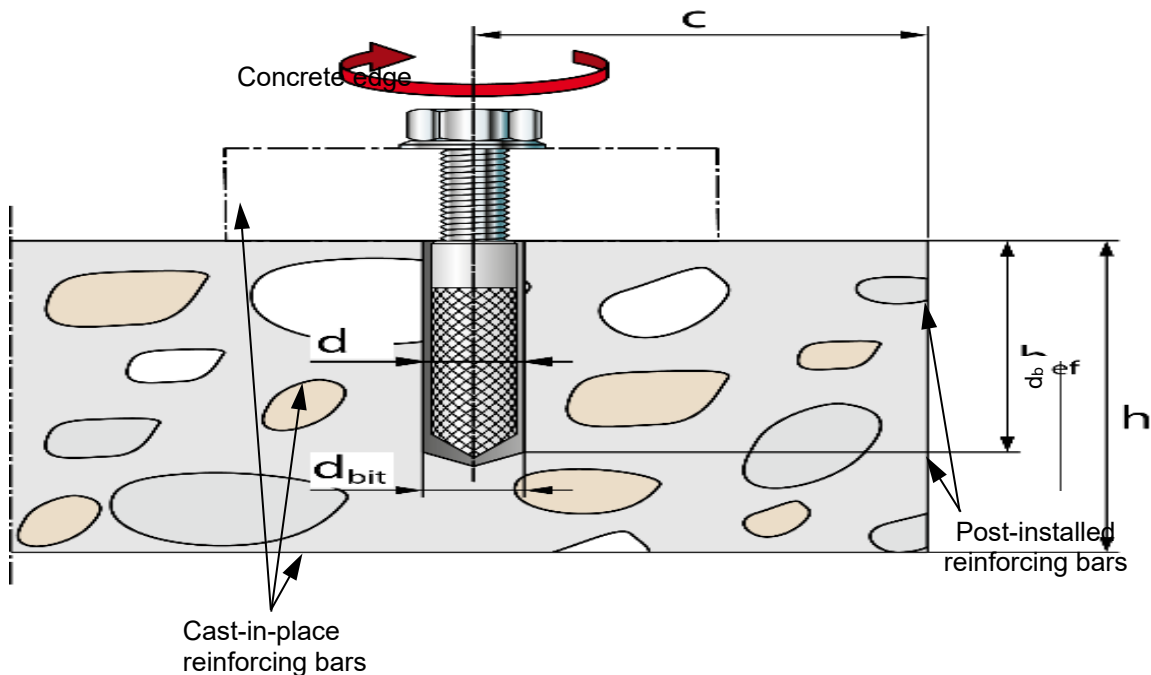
GENERAL INSTALLATION PARAMETERS FOR POST-INSTALLED REINFORCING BARS
